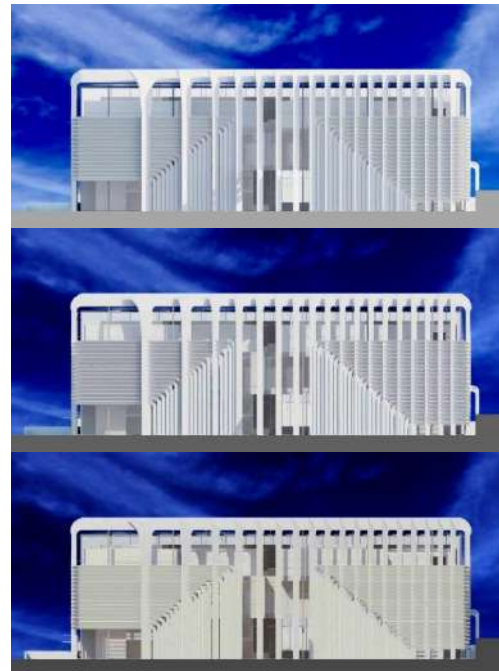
September 21, South elevation, 9 AM, 12 PM, and 3 PM (Personal Rendering)
